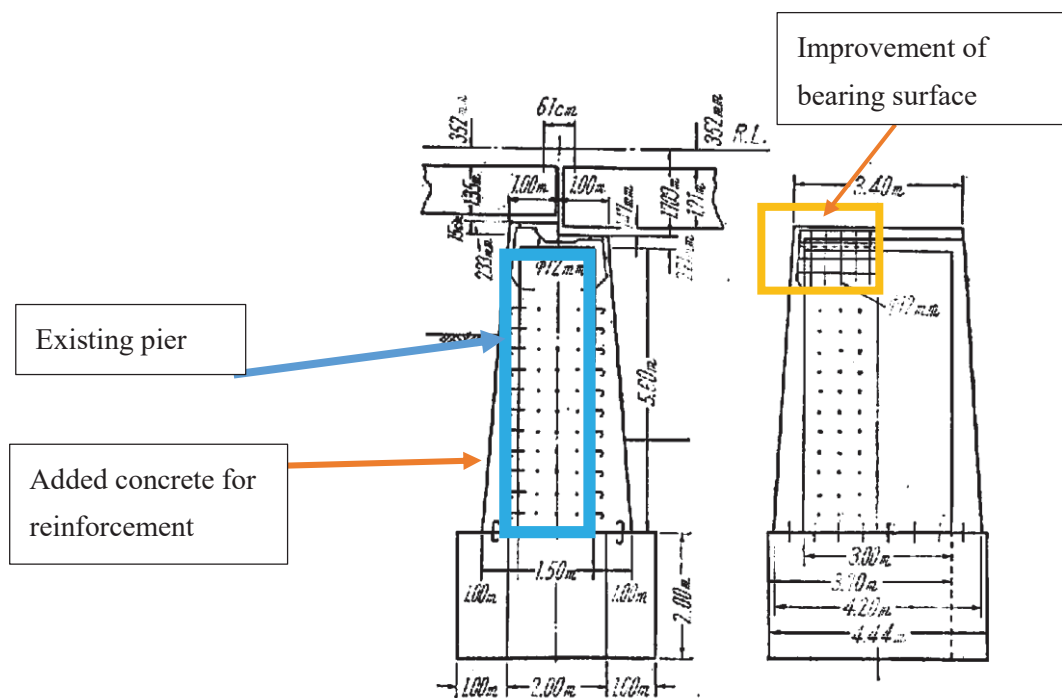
Typical bridge dimensions between Kotri Jn. and Budapur station
